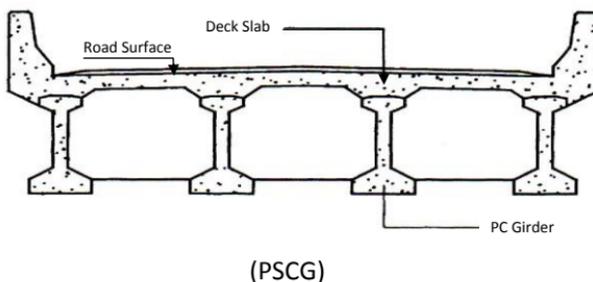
Concrete Girder Bridge (RCDG/PSCG)
